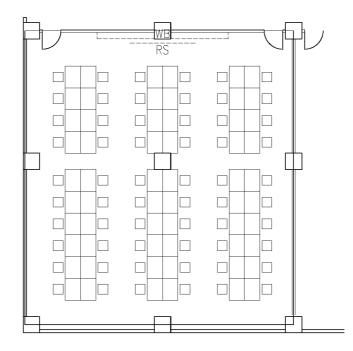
Laboratory B (General Access Laboratory) Floor Plan
